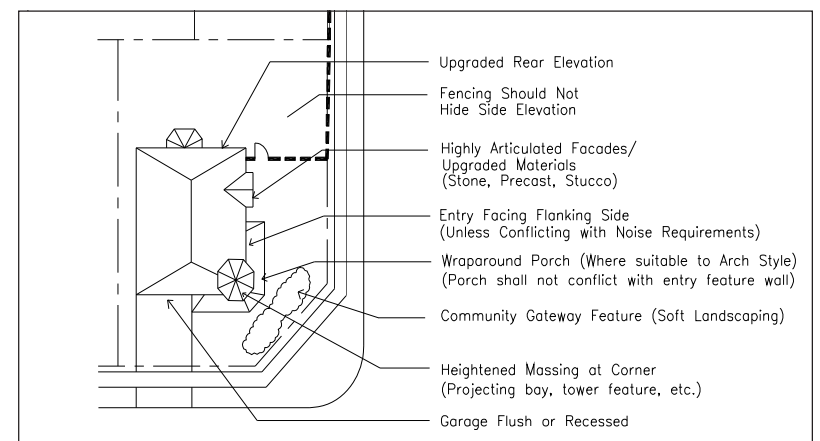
Conceptual plan view of Gateway Dwelling (single detached or townhouse dwelling)
